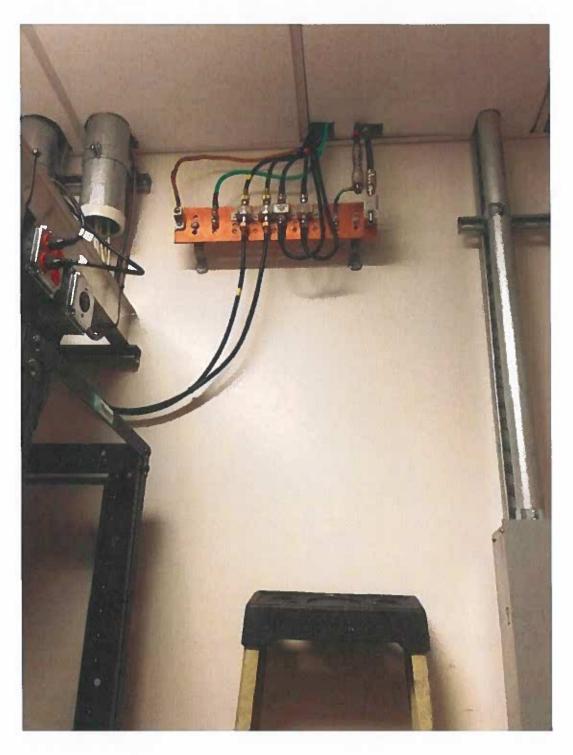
Photo of the other end of the Roof penetration inside the Main Equipment Room.
